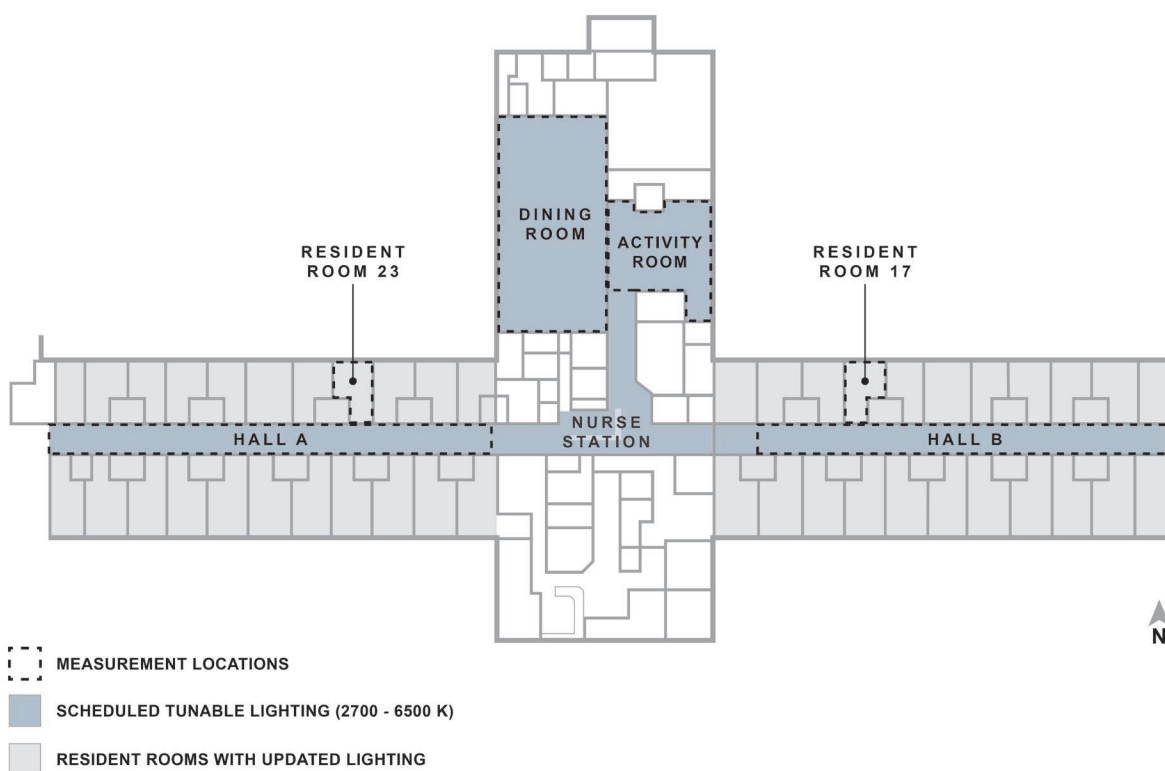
Oak Ridge Care Center schematic floor plan. Lighting measurements were taken in the rooms shown with a dashed outline. Programmed tunable lighting (intensity and CCT tuning) was installed in the blue shaded rooms. Lighting upgrades were also completed in the resident rooms; however, they were not incorporated into the central control system. The floor plan is not to scale.
